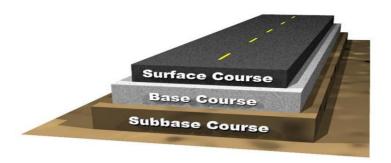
Basic flexible pavement structure (Haffman, 2008)
